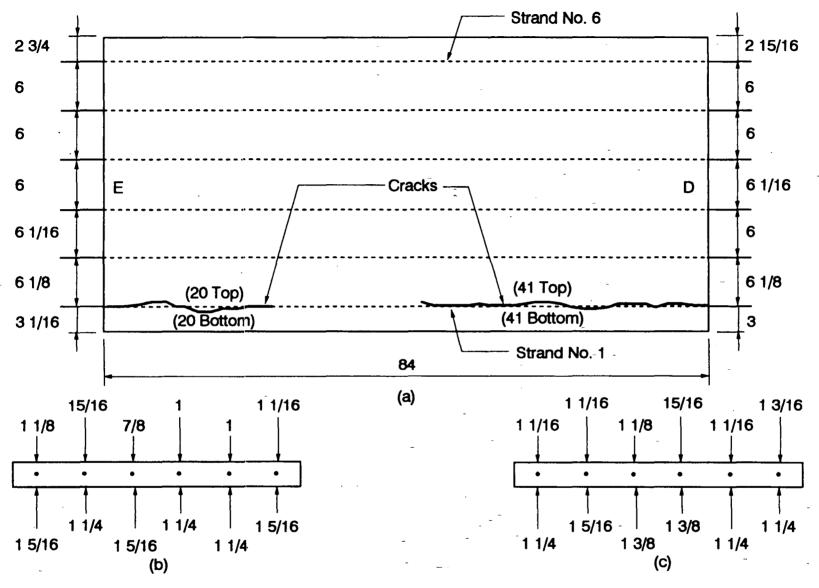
Specimen No. 5-2.5TC-4 (dimensions shown in inches):
